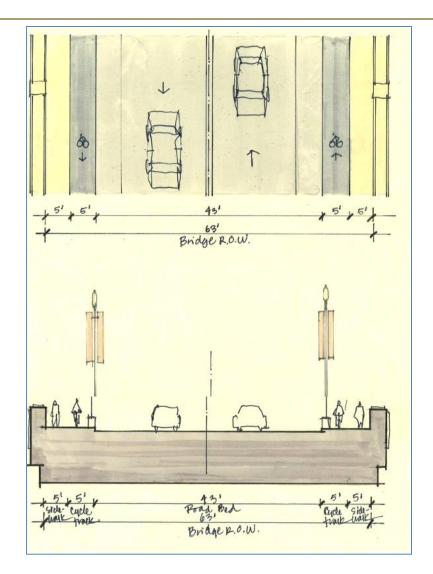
Derby-Shelton Bridge Segment Option 1 Cross Section
